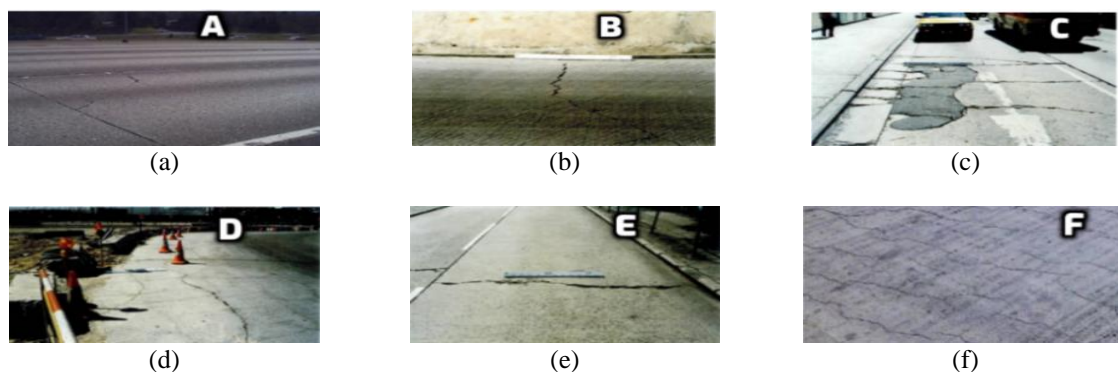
Types of concrete pavement cracks [11]: (a) corner cracks, (b) diagonal cracks, (c) block cracks, (d) longitudinal cracks, (e) transverse cracks, and (f) shrinkage cracks
